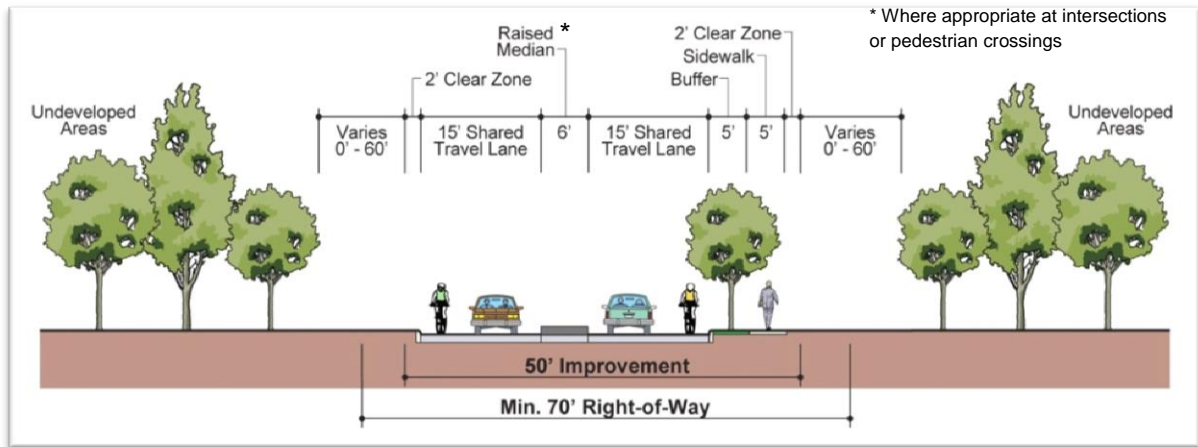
Typical Section from Magothy Bridge Road to Ritchie Highway (MD 2) – (Segment 4)
